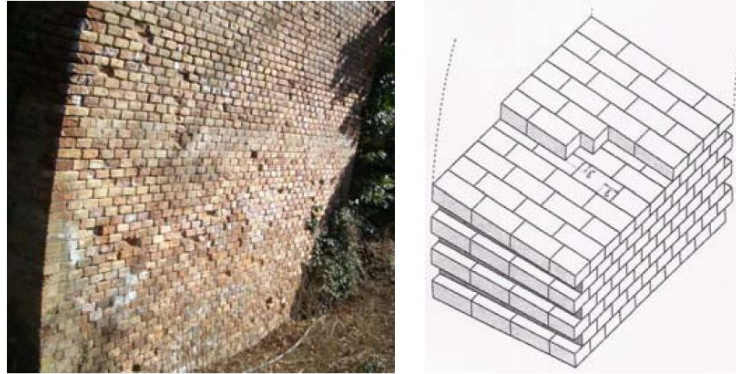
Brick arrangement of the vault of a masonry arch bridge (left) and schematic illustration of the texture (right).
